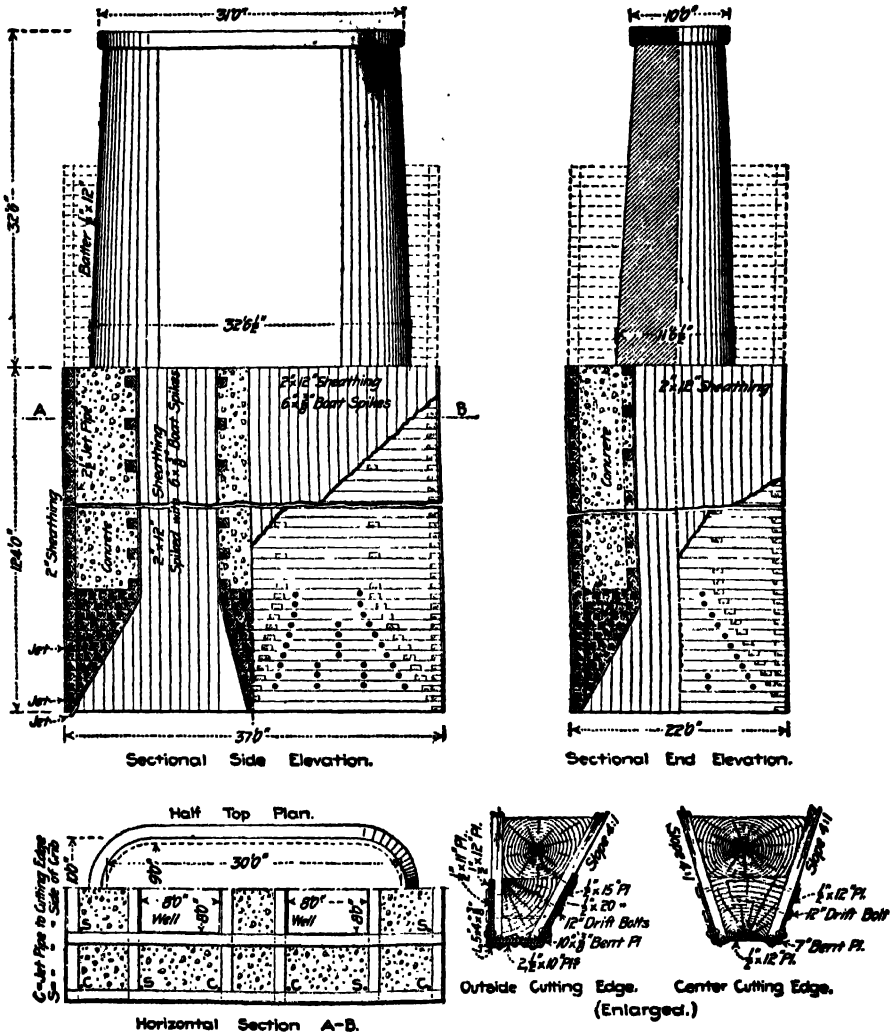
Open-dredging Caisson and Cofferdam for the New Westminster Bridge over the Fraser River.
